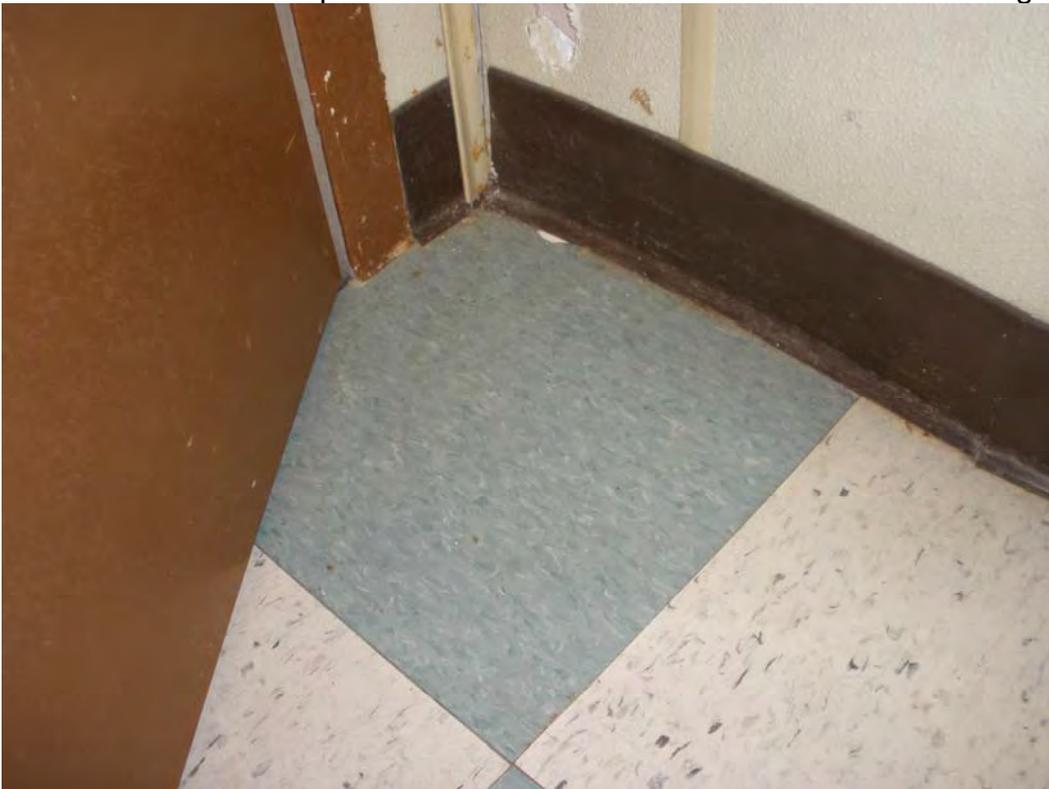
ACM black mastic under 2<sup>nd</sup> layer beige floor tile-Gym restroom Alder Wing
